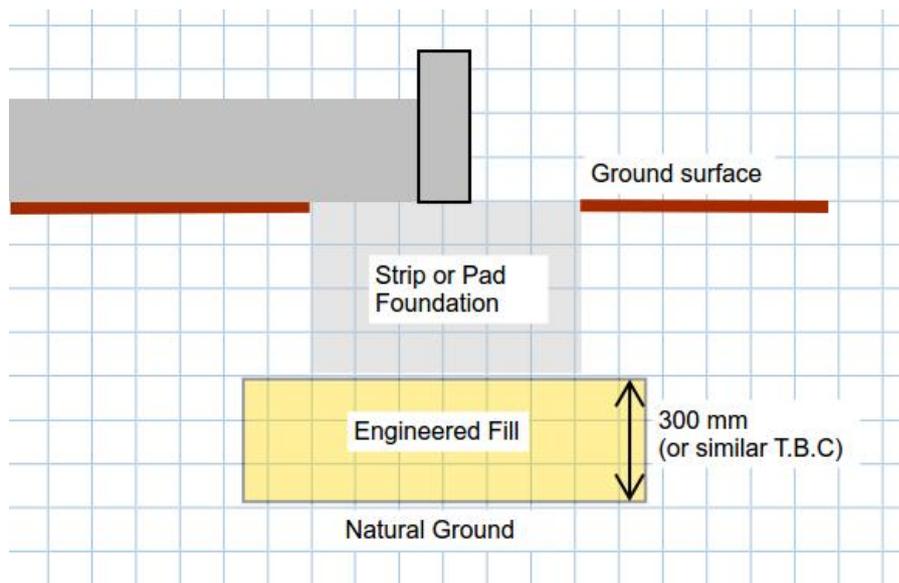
Schematic cross-section showing a typical strip footing solution using engineered fill.
